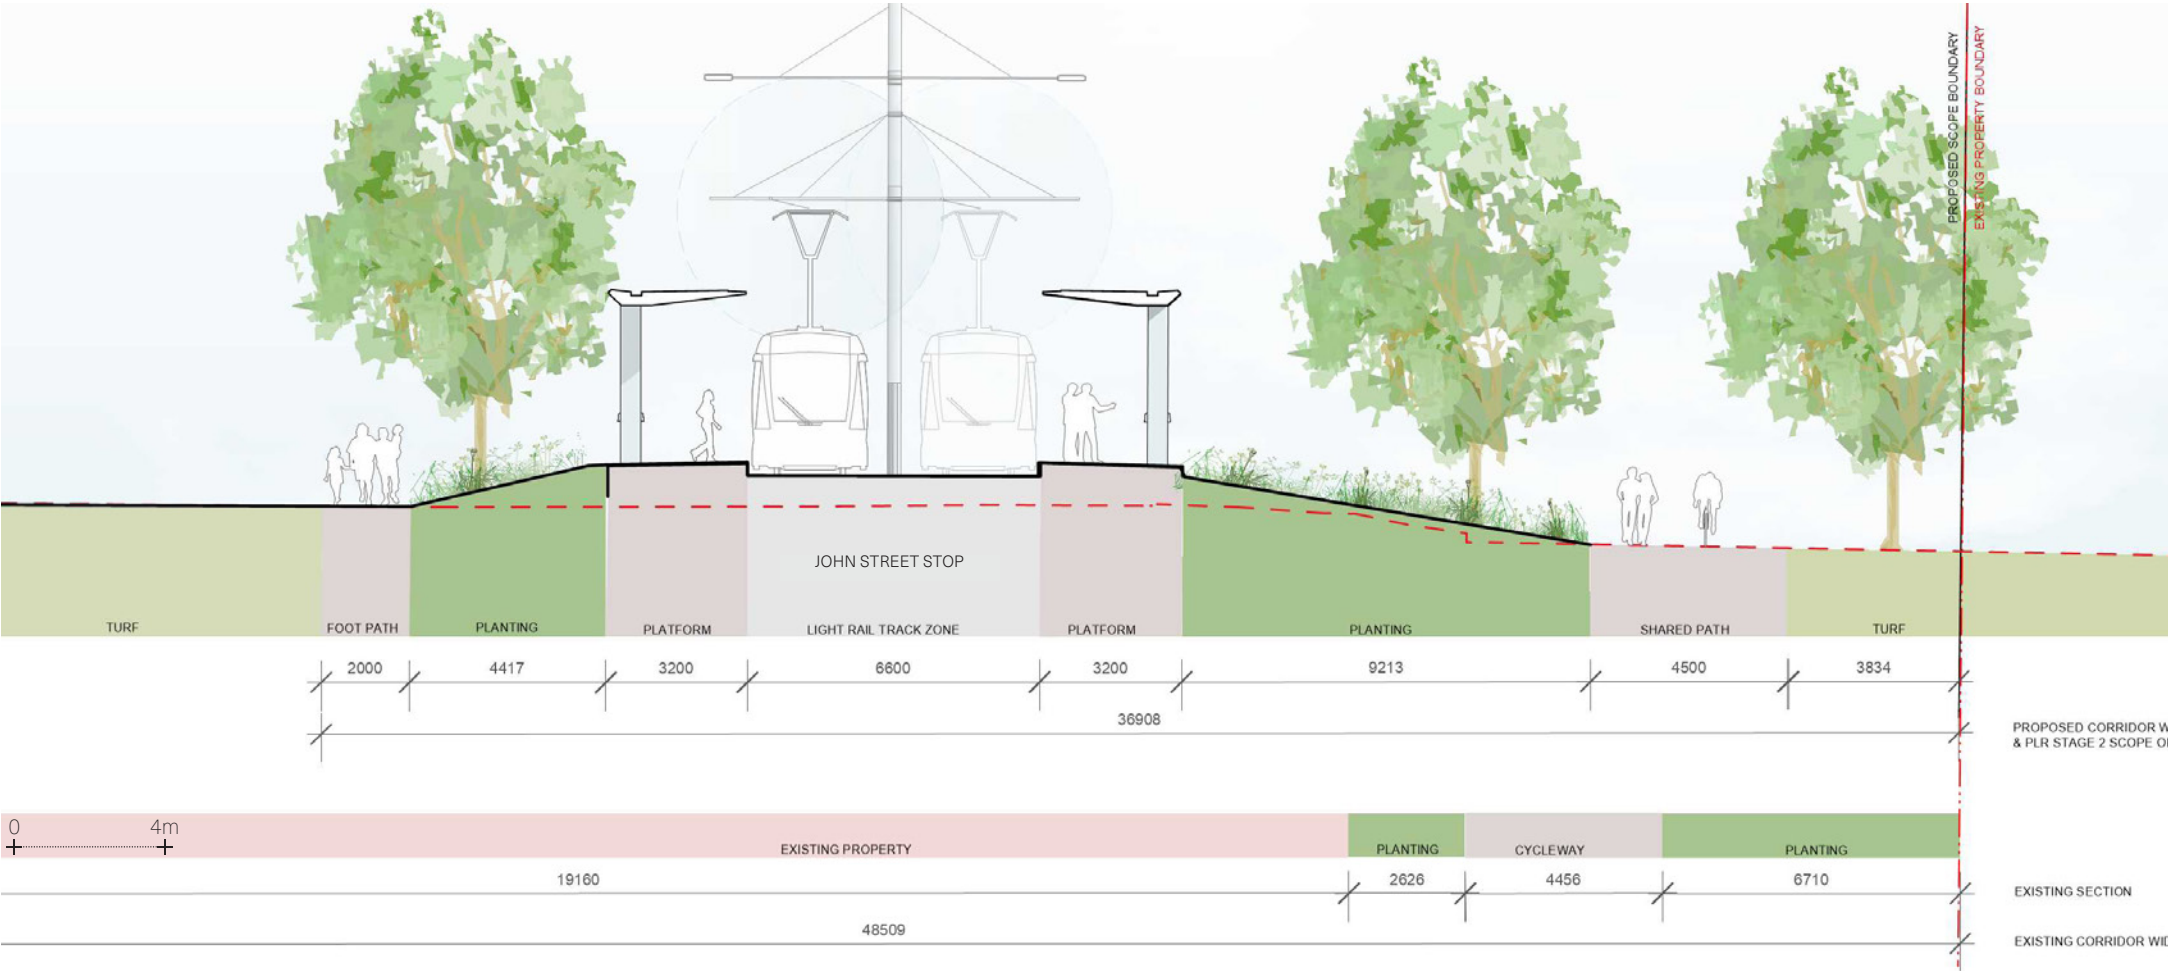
Cross section 02 - John Street Stop (indicative only - subject to design development).
